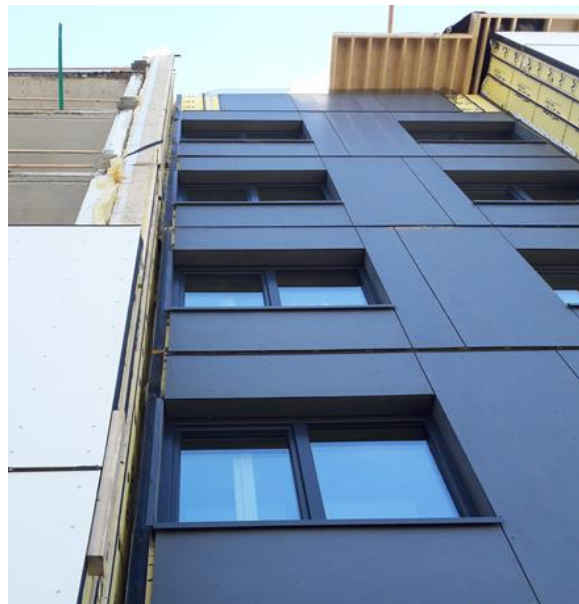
Building process at the pilot building site (spring-autumn 2017)
